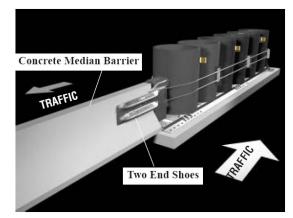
Permanent Construction which does not require Below-Grade Anchor Block
